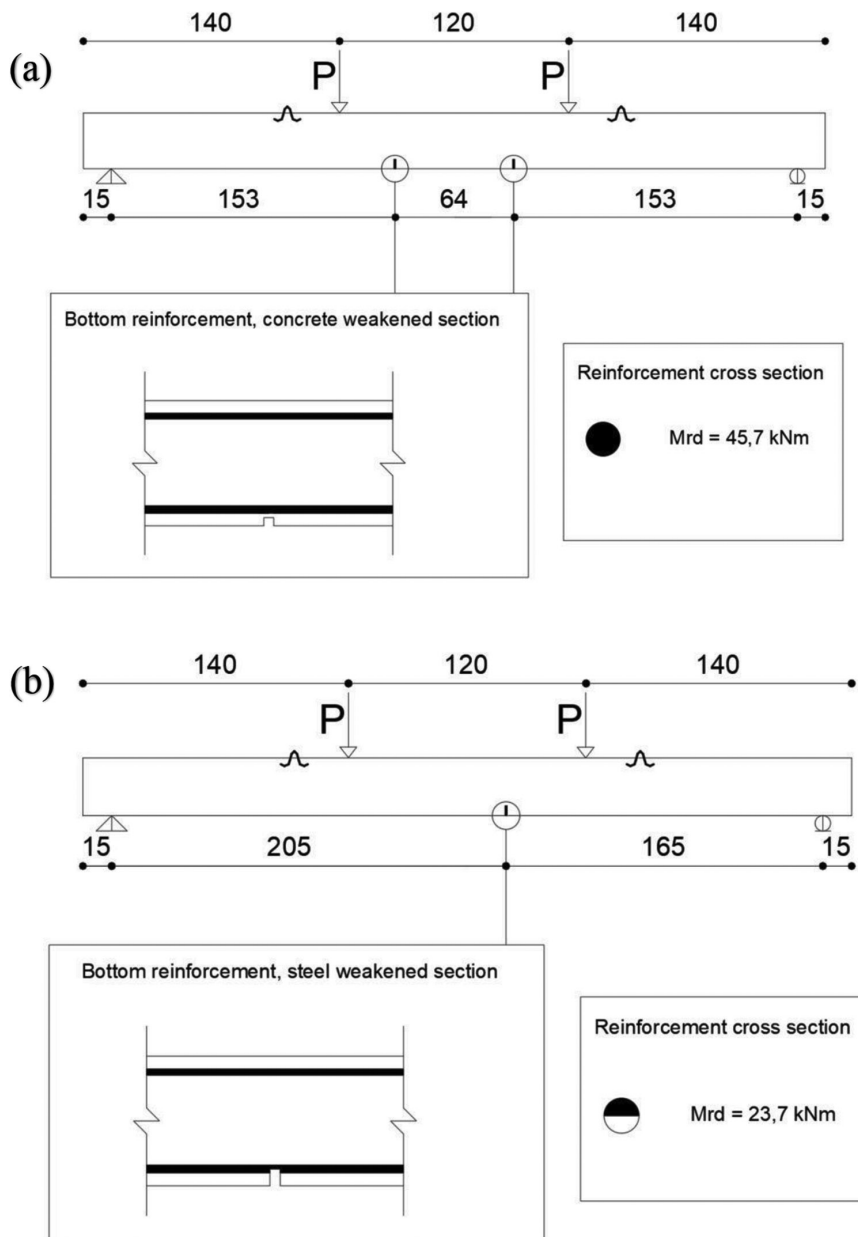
(a) General scheme for four-point bending tests with positioning of notches for Beam 1; and (b) location of steel weakened section for Beam 2. (Note: M_{rd} is design bending moment.)
